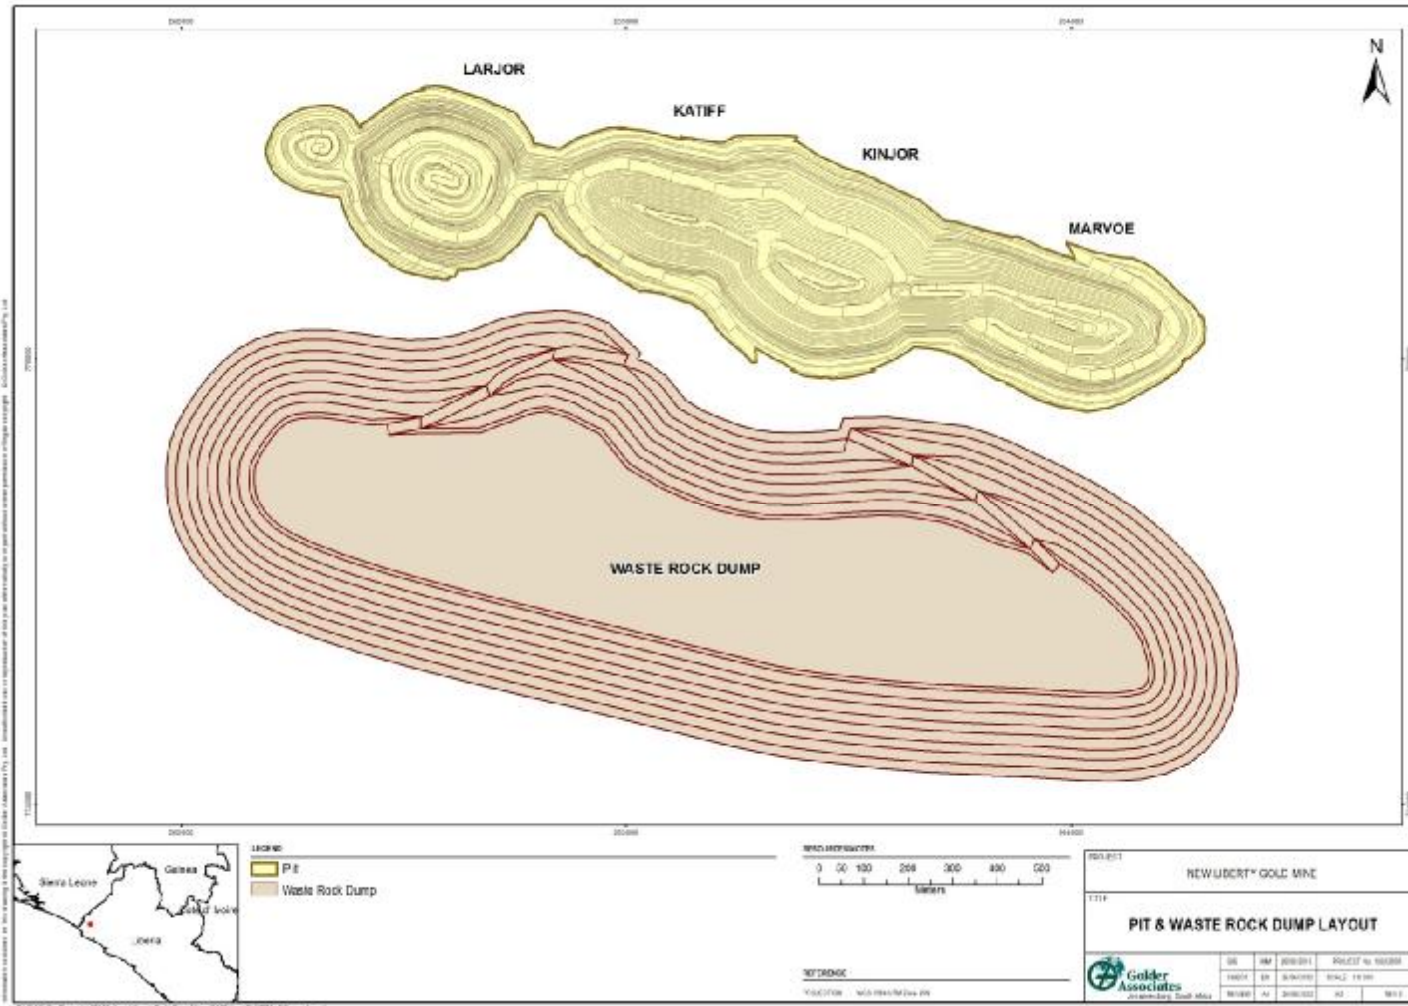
Final Pit Layout and Waste Rock Dump (WRD) Design (AMC, 2012)
